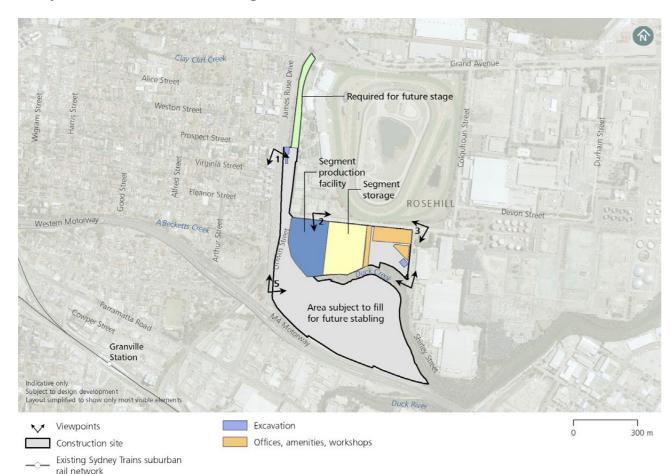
Clyde stabling and maintenance facility construction site - Representative viewpoints
